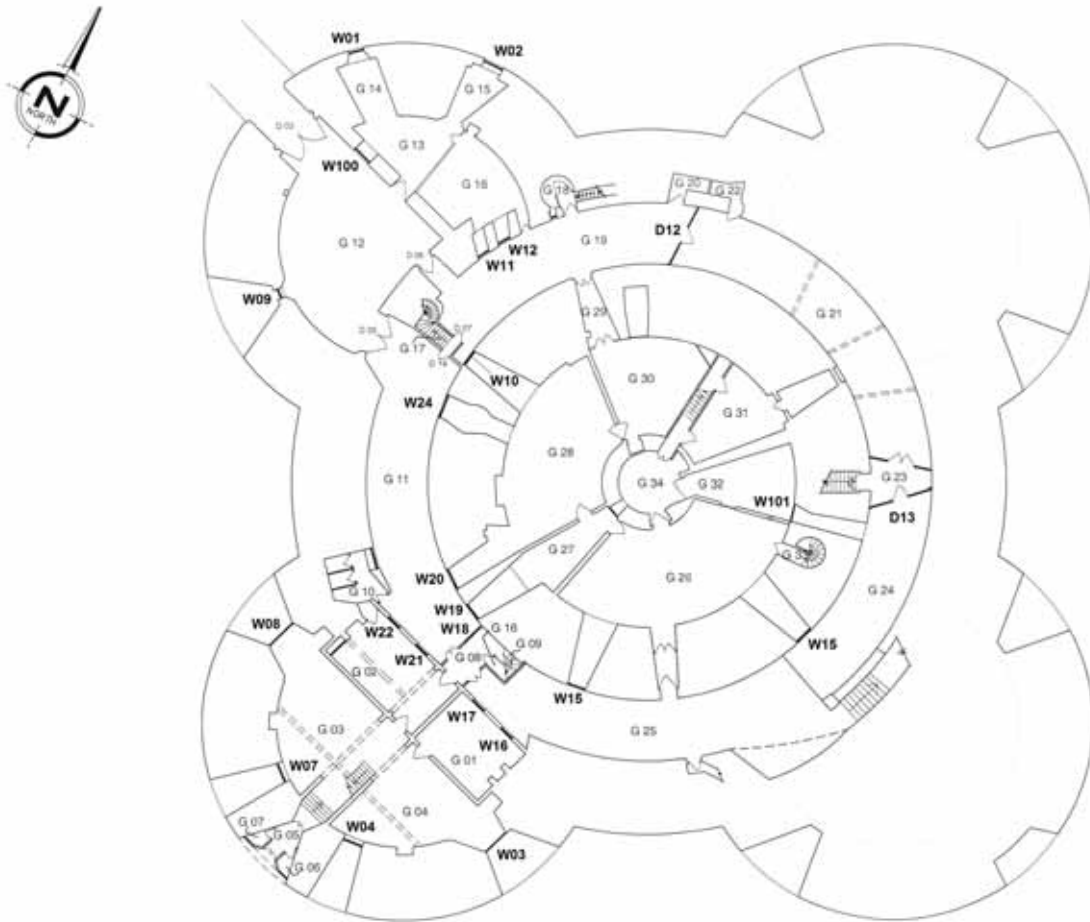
Ground floor plan of Walmer Castle (© Broadway Malyan)
